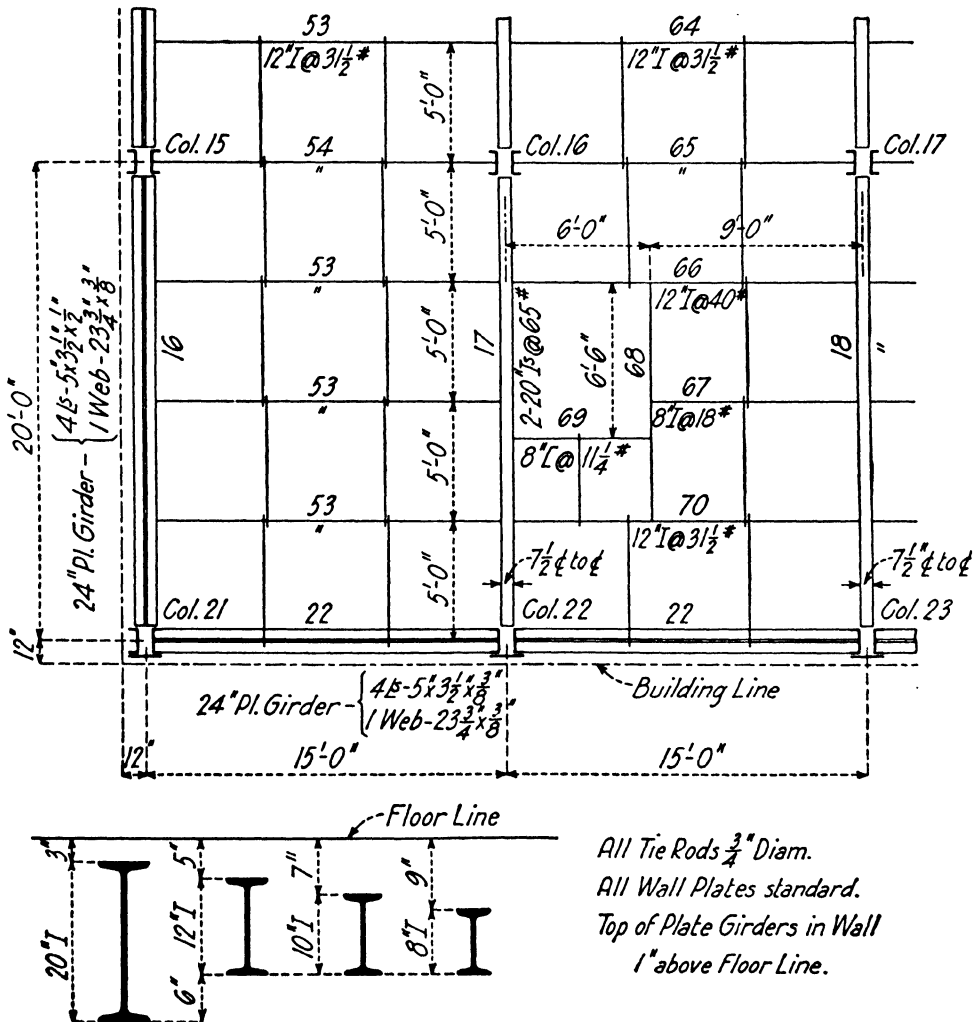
FLOOR PLAN OF STEEL OFFICE BUILDING.
